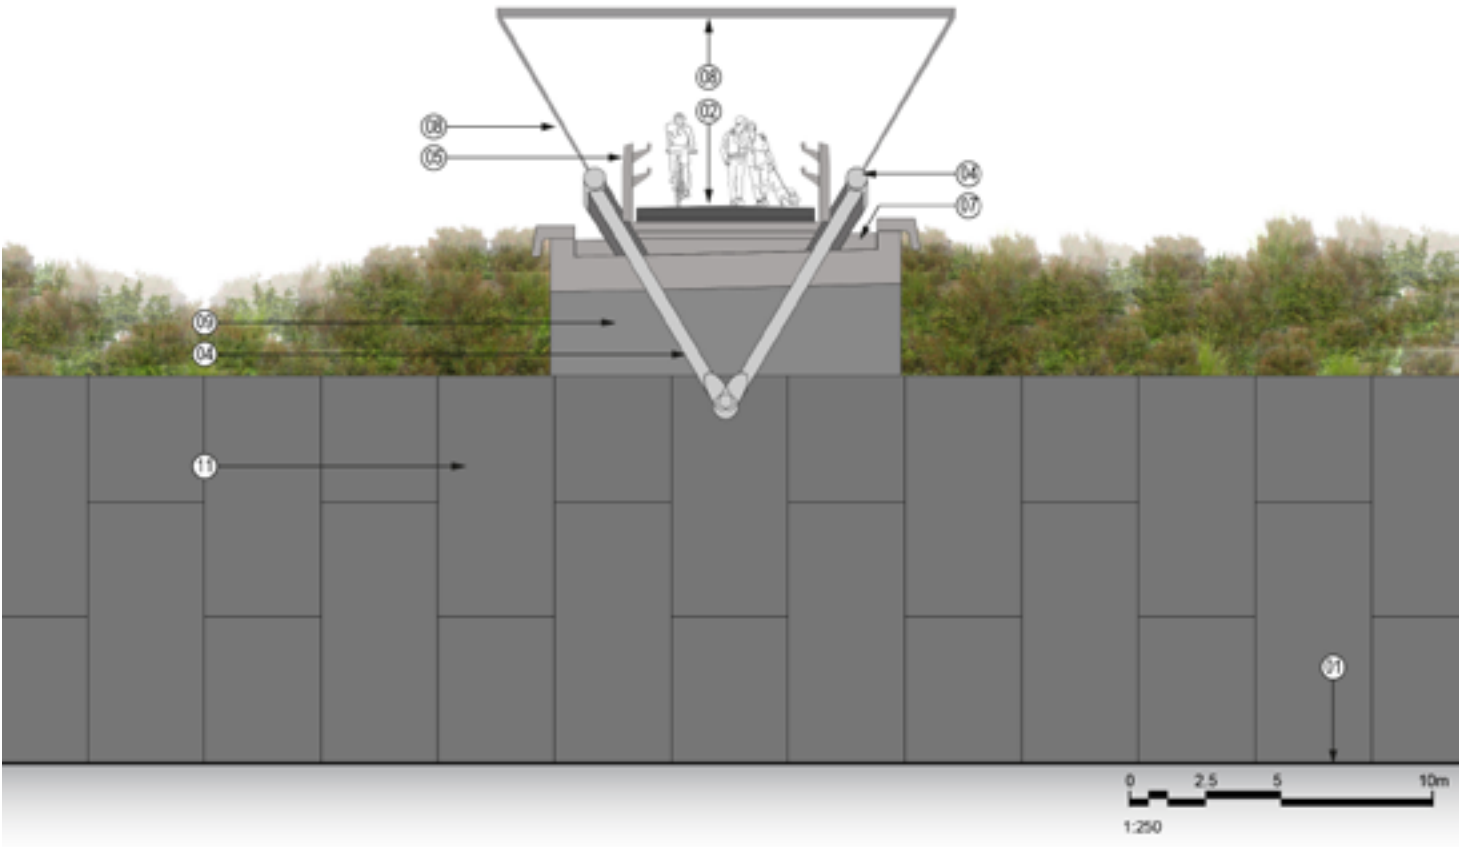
Section - BR16 - Shared user path bridge over M7 Northbound exit ramp
